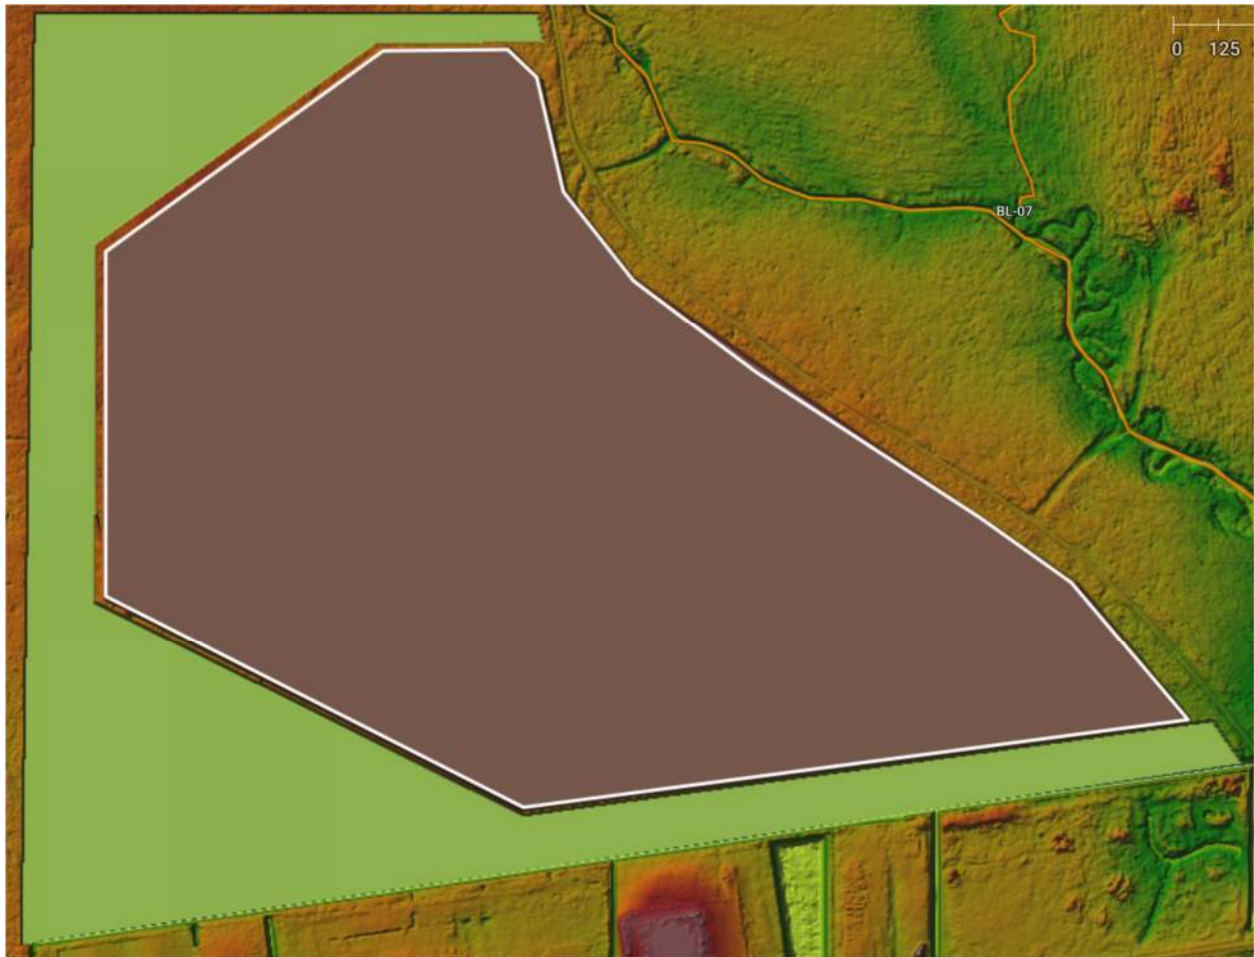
Potential Layout Alternative 1 (Maximum Allowable Fill Area While Still Meeting Fill Mitigation Requirements)
